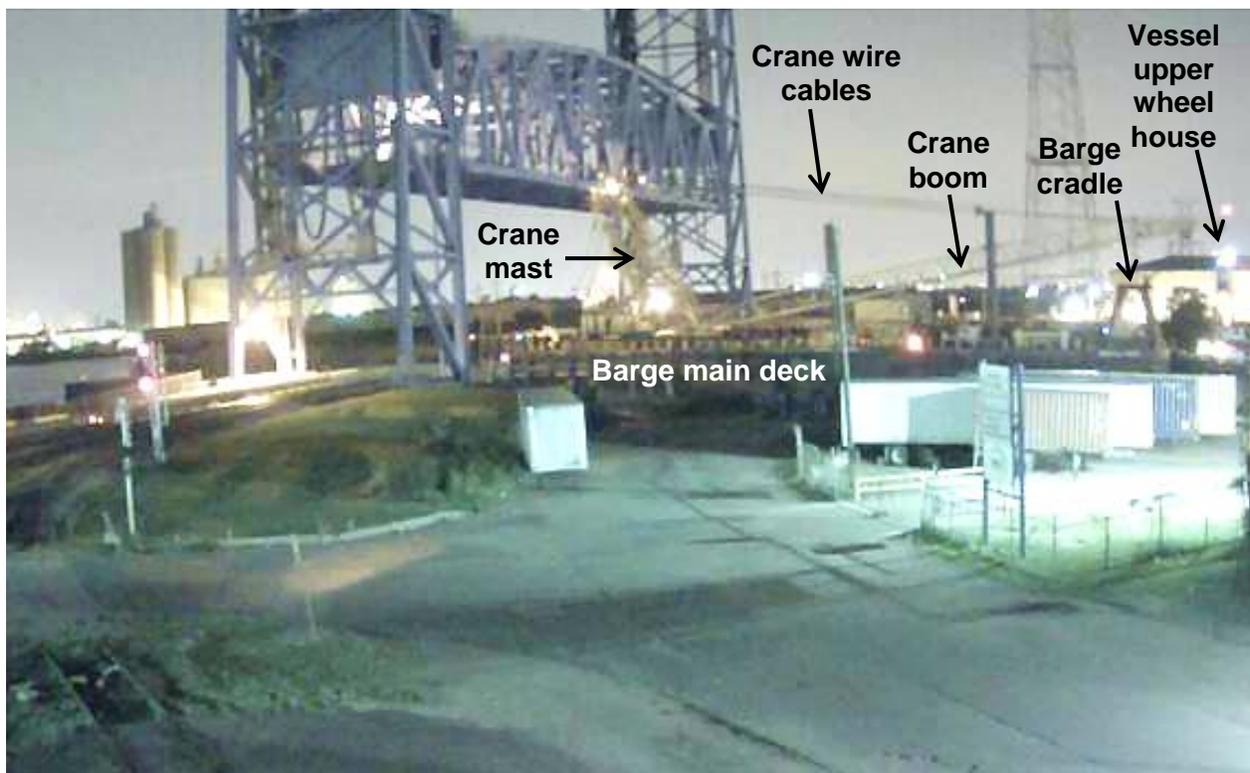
Postaccident photo of the Florida Avenue Bridge, seen from the northeast looking toward the southwest.
